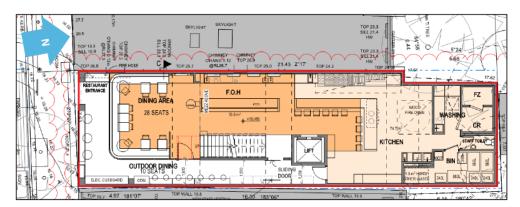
Proposed Ground Floor Plan (Image Source: YBL Remmus Architecture)
